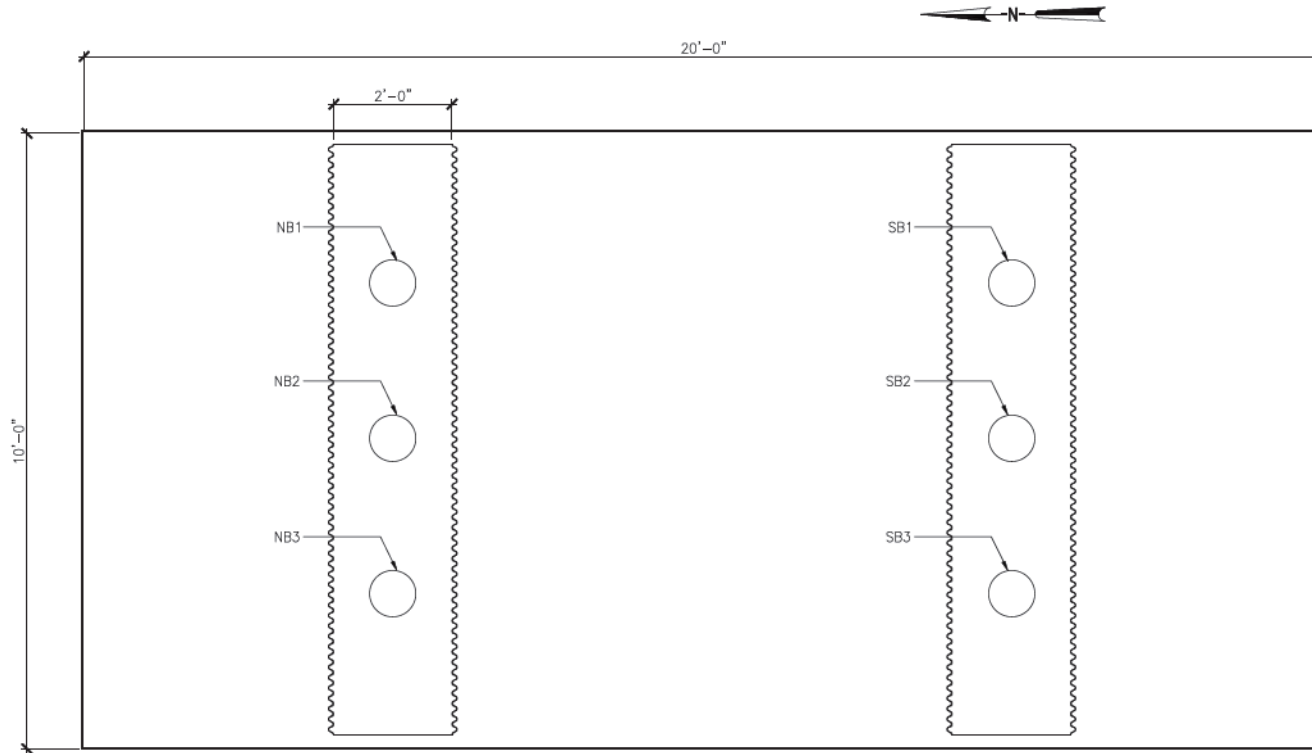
Earth pressure cell layout through Section E-E for 24 inch steel pipe test
